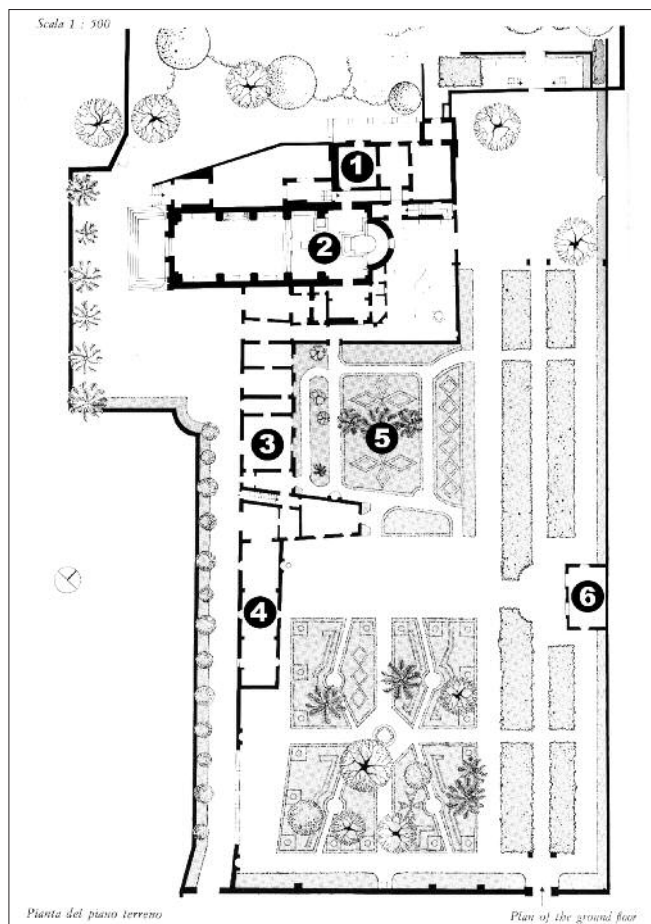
Ground floor plan of the Villa Magistrale: 1. Palace, 2. Church of Santa Maria in Aventino, 3. Service building, 4. Bocce court, 5. Secret garden, 6. Stanzone di ritiro (or Coffee-House) (from I. Belli Barsali, with author's annotation).
